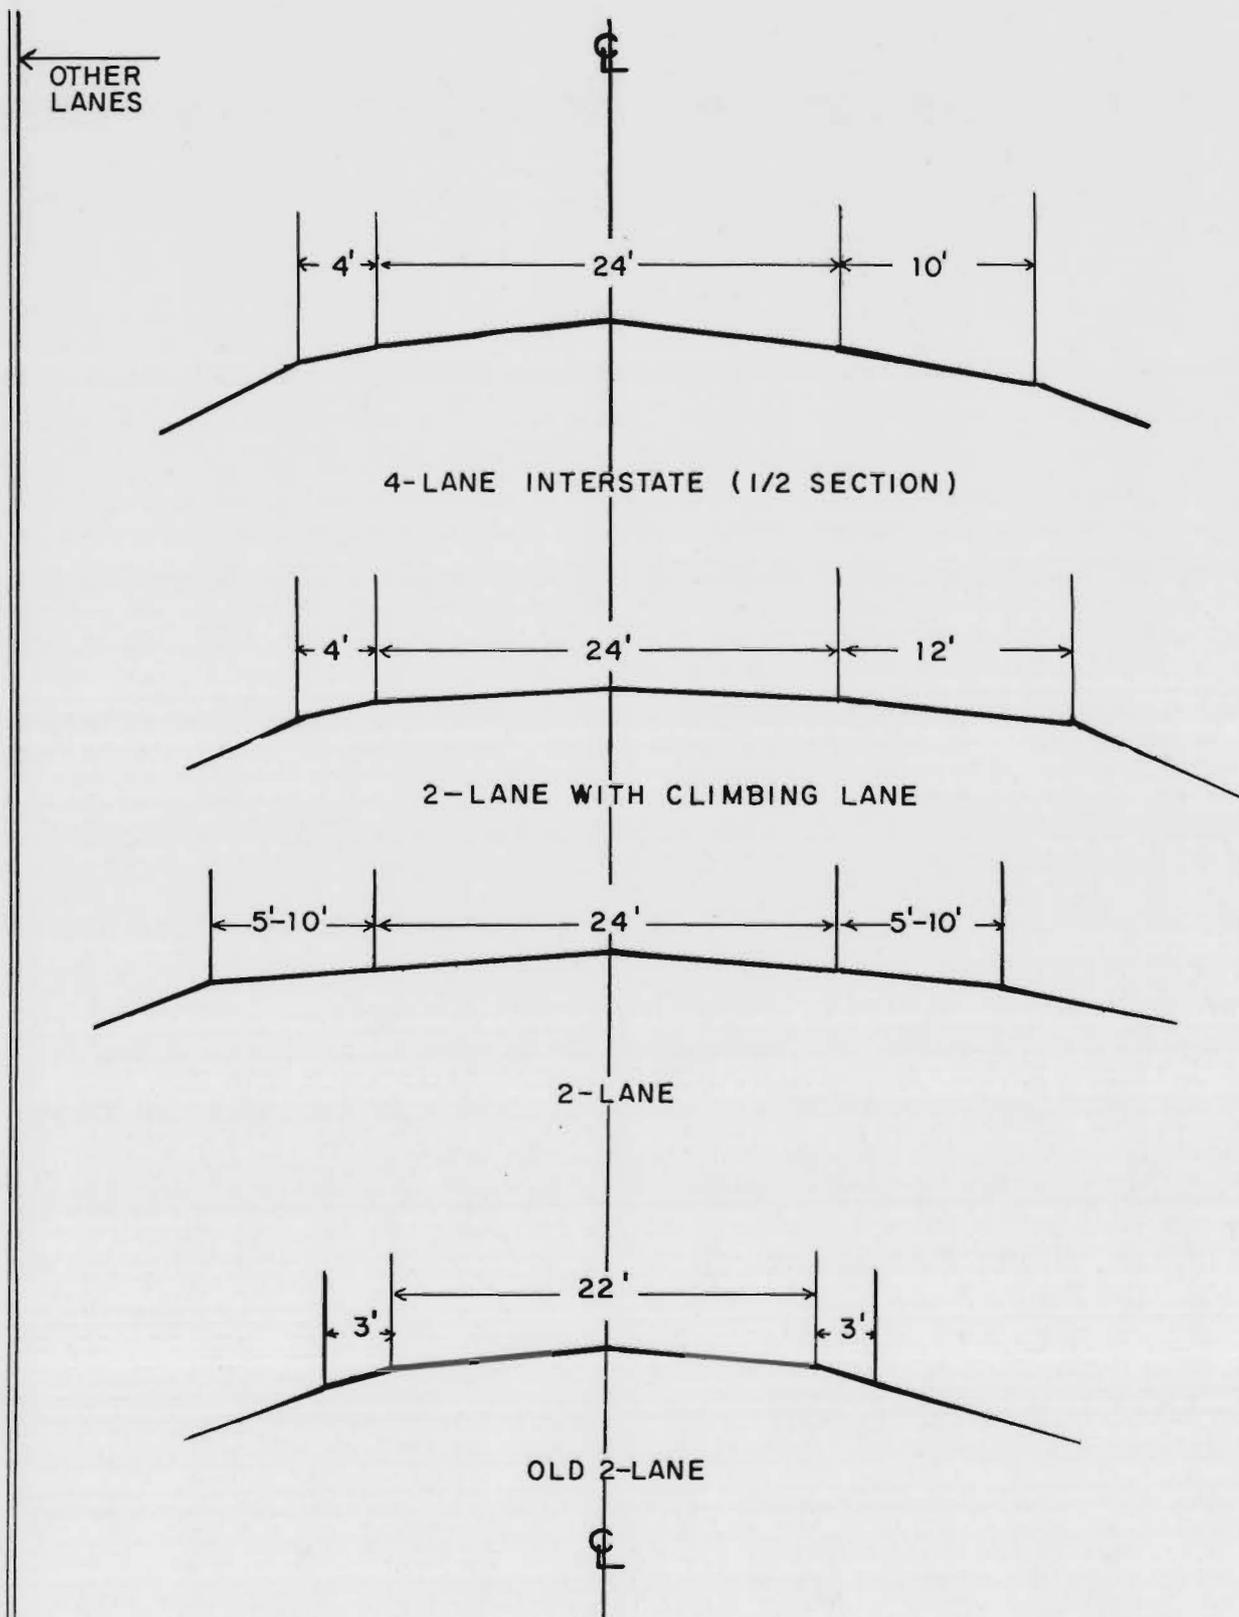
TYPICAL CROSS SECTIONS OF HIGHWAYS USED IN STUDY.
